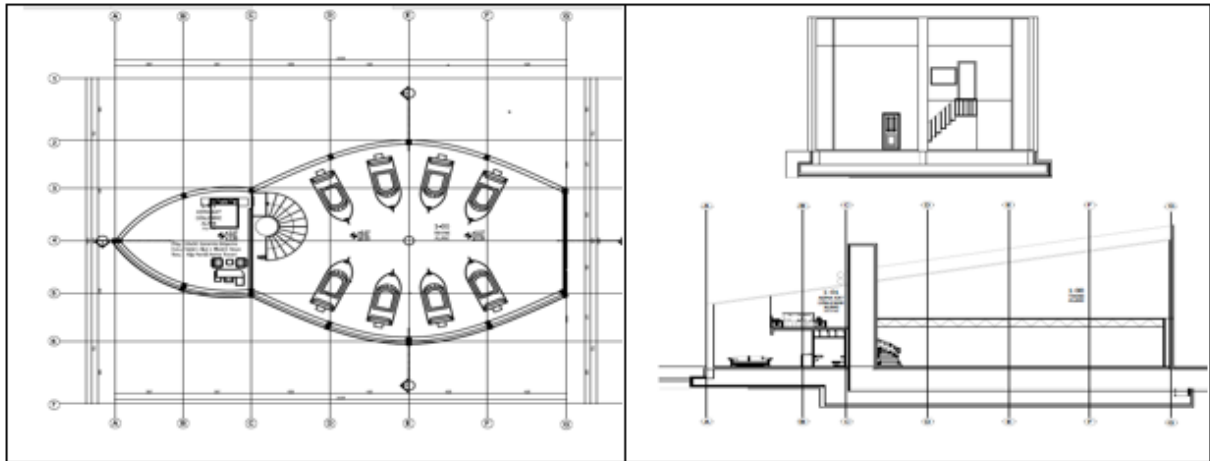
Ankara sailing club project in Gölbaşı (longitudinal section and cross section plan)
